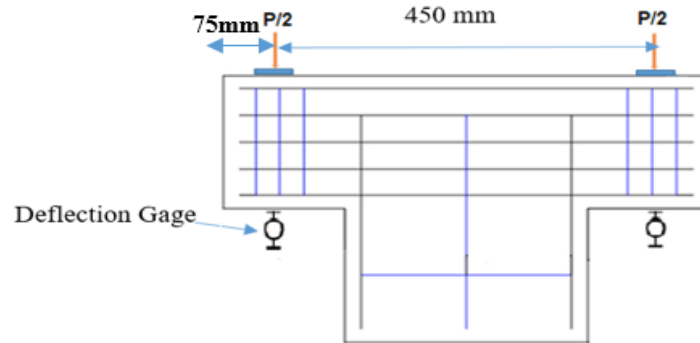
The layout of Points Loads and The Deflection Gauges for Pier Specimens
